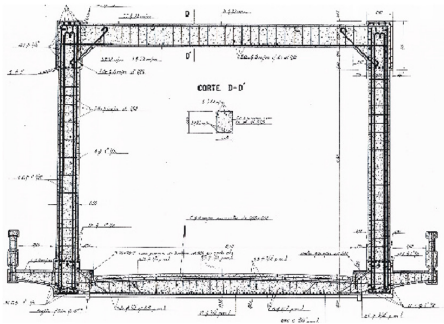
Arch bridge and reinforced concrete structure details (photograph a2p archive, Drawings [15] a2p archive. Edgar Cardoso
